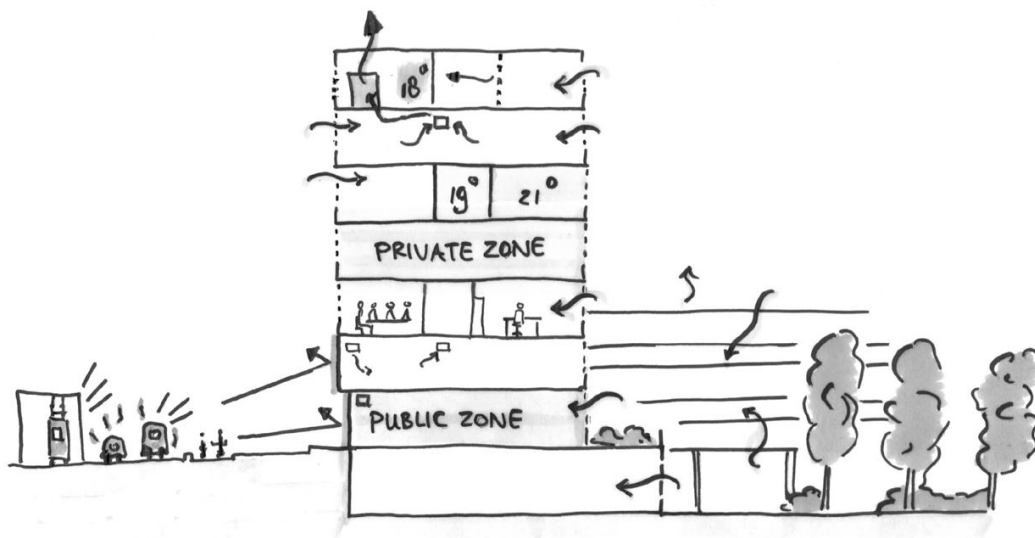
Relation between the building, its surroundings and the organizational lay-out, in the new, renovated situation.
